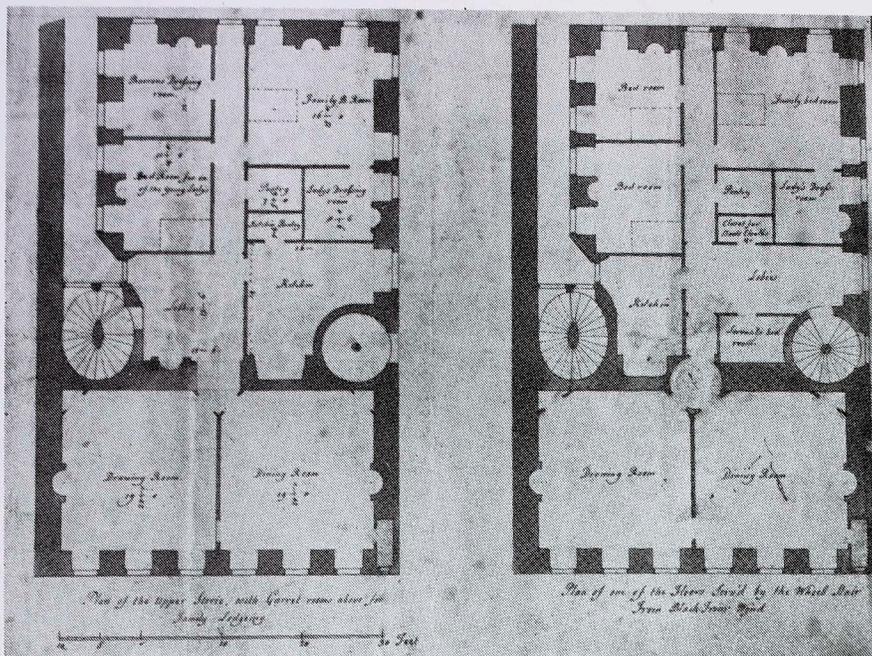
'Plan of the Upper Storey, with Garret rooms above for Family Lodging' and 'Plan of one of the Floors Serv'd by the Wheel Stair From Black Friar Wynd': the Craigston plans (reproduced by courtesy of Bruce Urquhart of Craigston).
